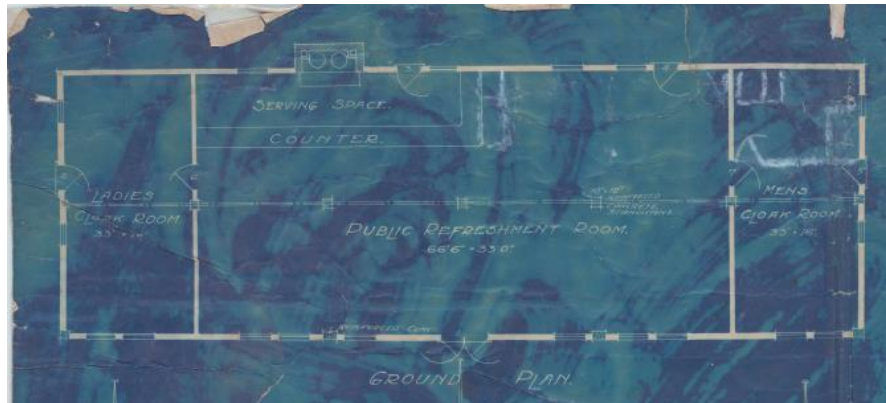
Detail from Jorgensen's 1923 blueprint architectural plan showing original layout of the ground floor amenities
